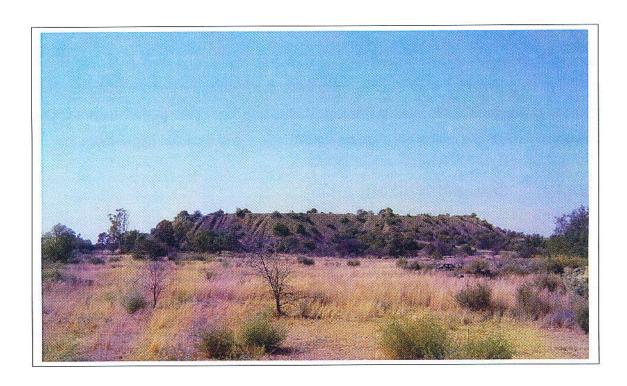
The damaged wall of the Renoster River which has to be reconstructed in order for the new diamond mine to commence with its operations (above)
